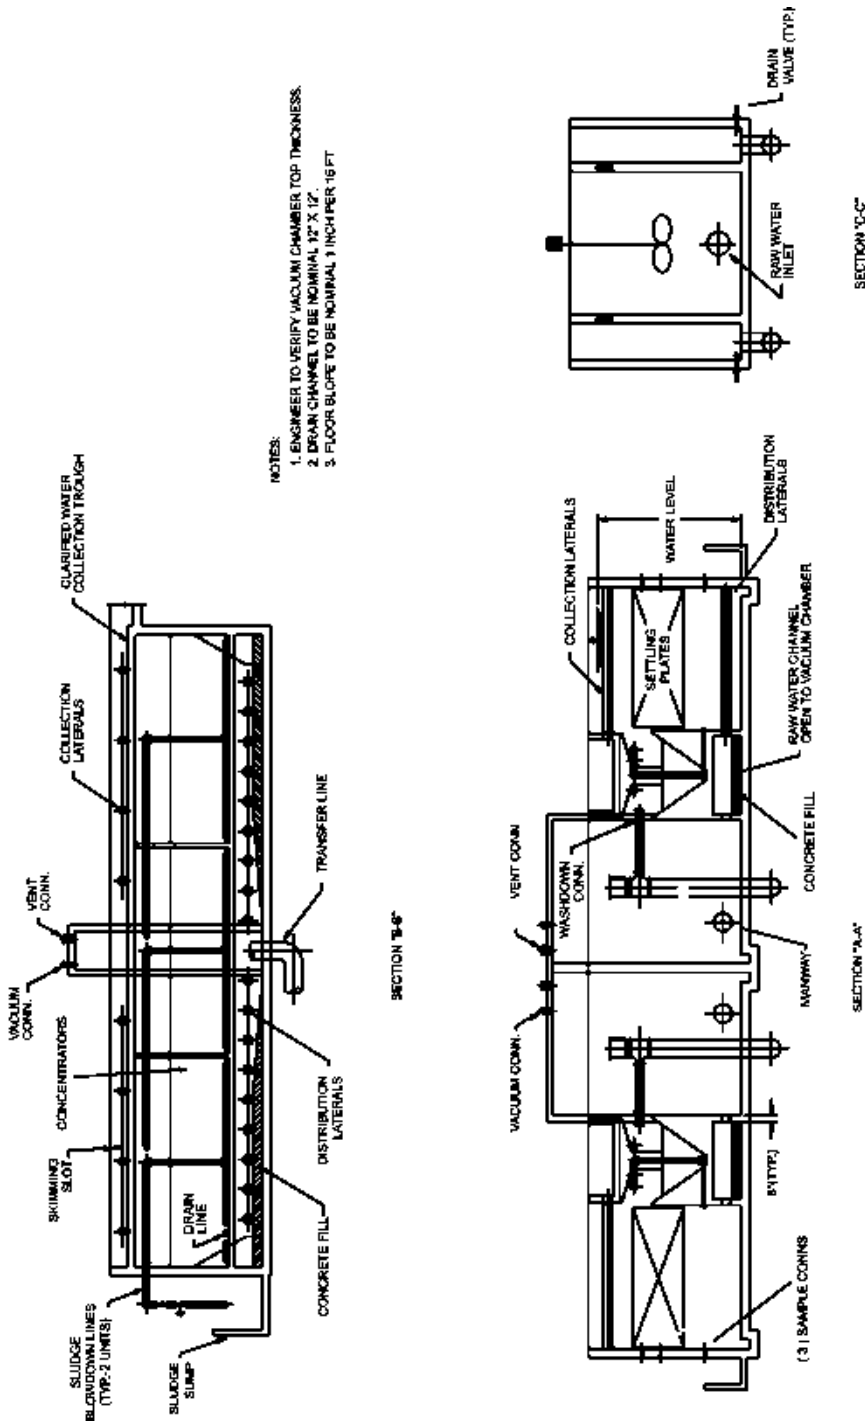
Superpulsator clarifier layout and section views (Courtesy of Inflico Degremont, Inc.)
